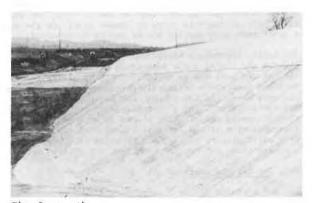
Mas d'Armand dam - Upstream slope facing.
